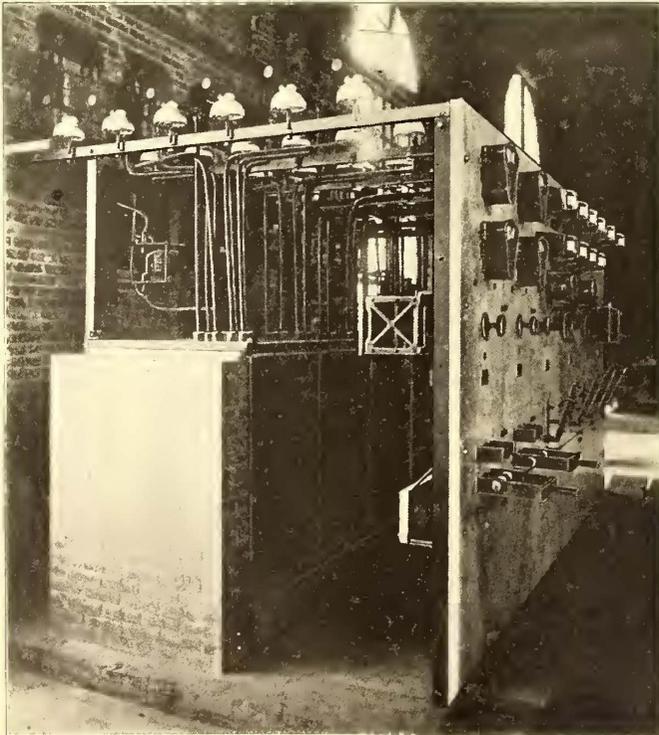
SWITCHBOARD WIRING AND BRICK CELLS FOR OIL SWITCHES
